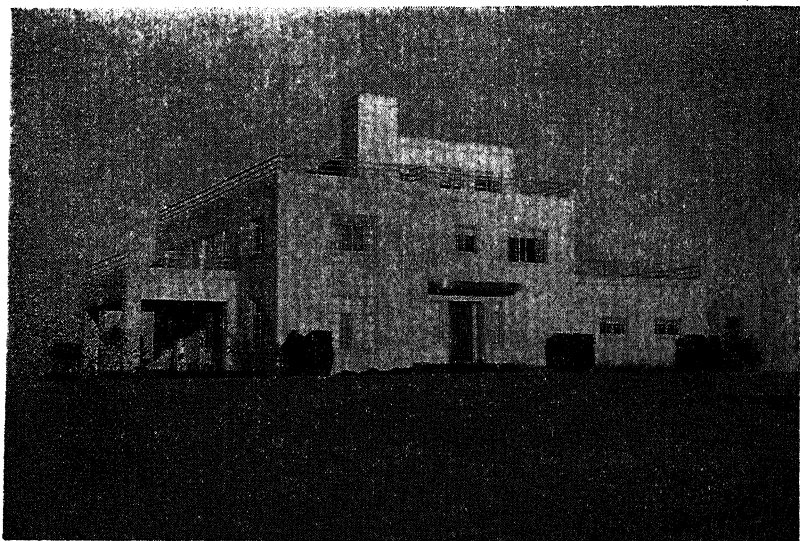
Welded framework for this 12-room home in Wichita Falls, Texas. Includes 96,000 lbs. of steel. Floor beams, 10 in. high, were shop fabricated from 2" x 2" x 1/4" angle and 1 1/2" x 1 1/2" x 3/16" lattice. Maximum beam span is 18 ft. Walls have 3 in. channel studs with 3/4" lath channel and expanded metal lath. Welded steel framework added 15% to the cost of the house frame but reduced insurance rates from \$1.50 per hundred to 30c per hundred.
